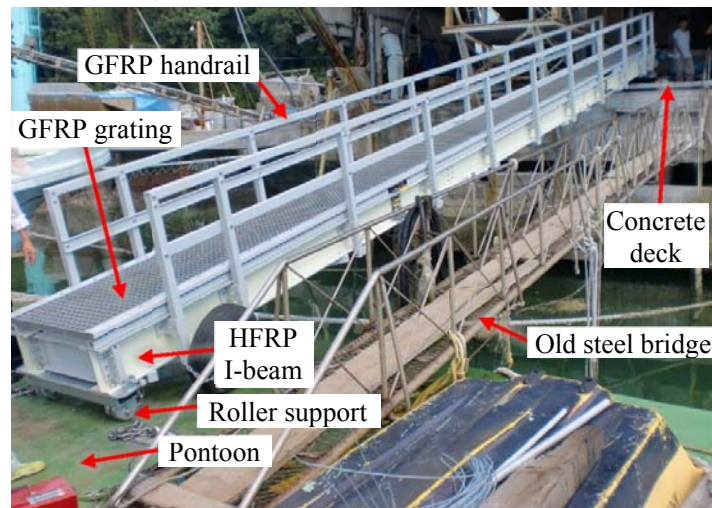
HFRP short span pedestrian bridge in Kure city, Japan
